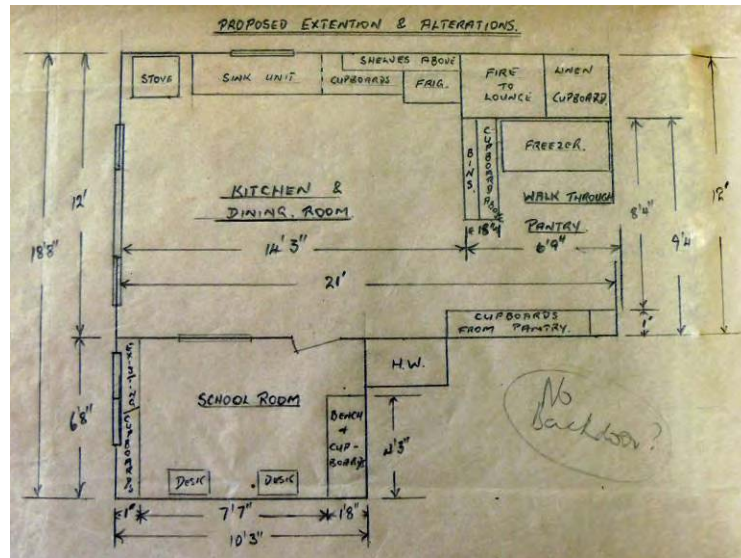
Plan showing the proposed alterations to house one to add schoolroom.
